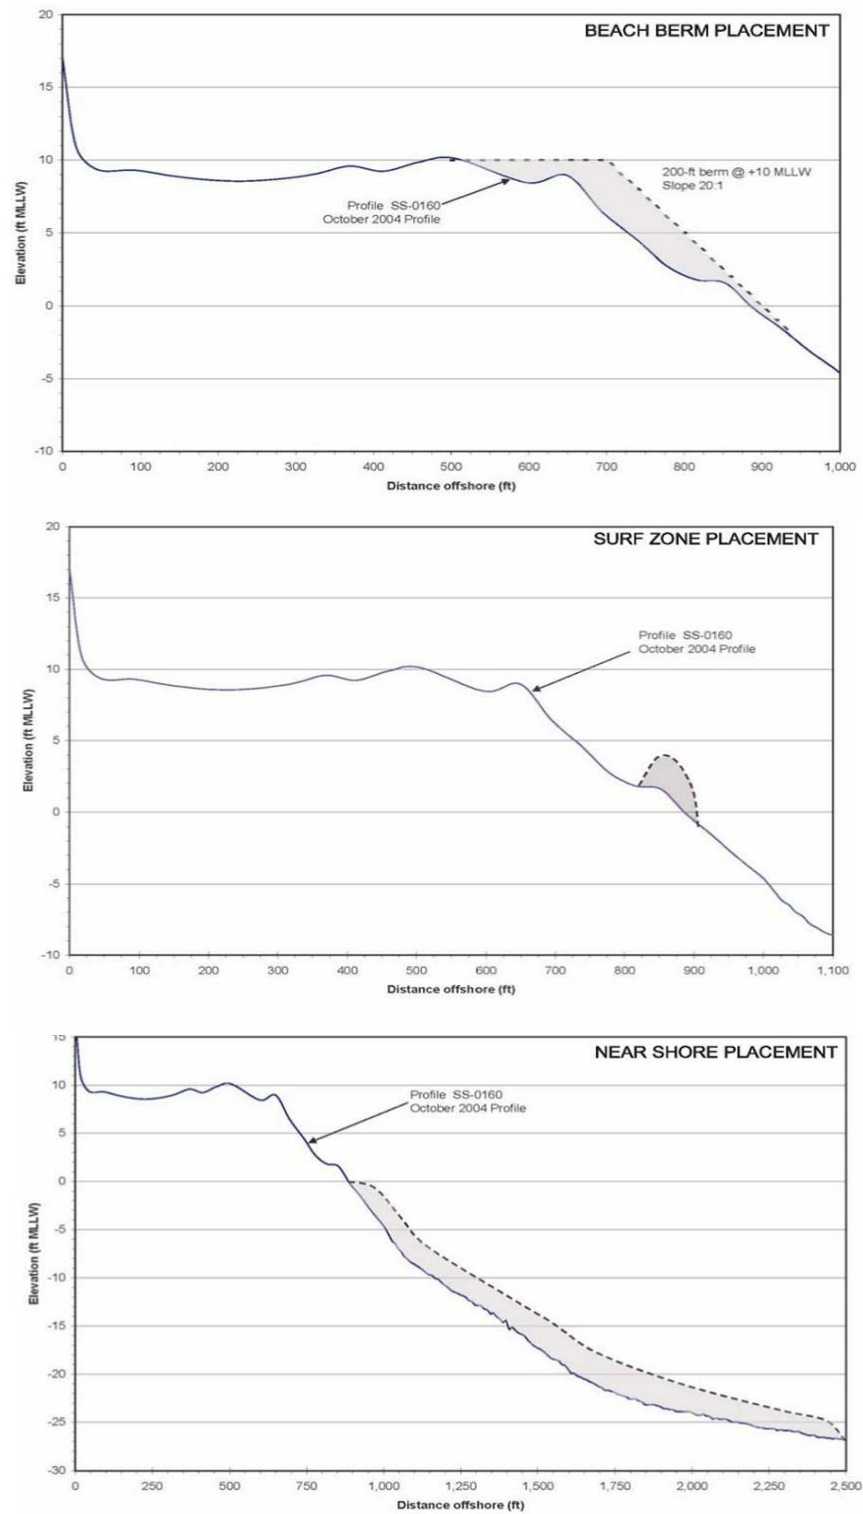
Cross Sectional Views of CRSM Plan Placement Options
